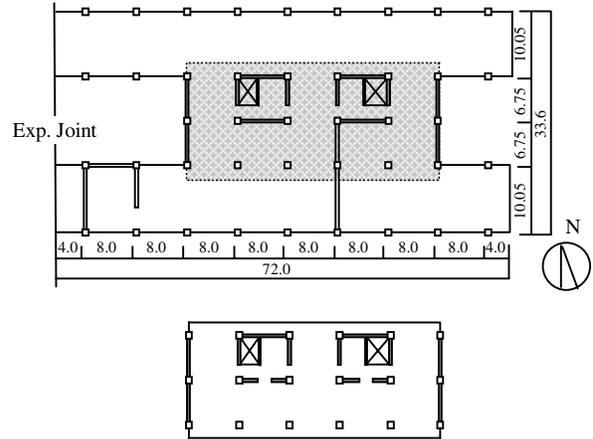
Plans at the 1st floor (top) and the 3rd floor (bottom)
